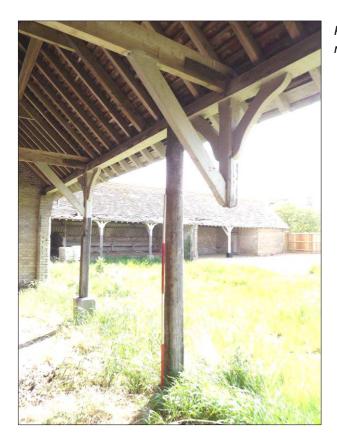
(Shot 43): Detail of cut off roof support and replacement post, looking southeast. 2m scale
